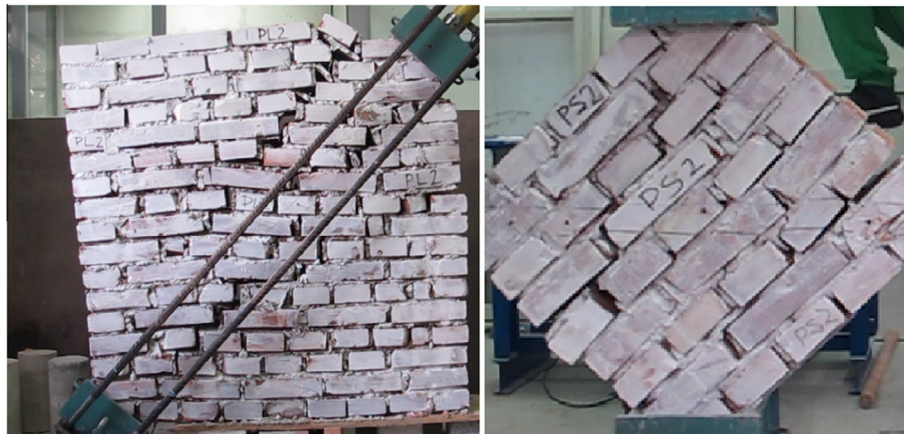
Failure of plain specimens: crack development across the compressed diagonal; (a) standard size wall; (b) half-scale wall.
